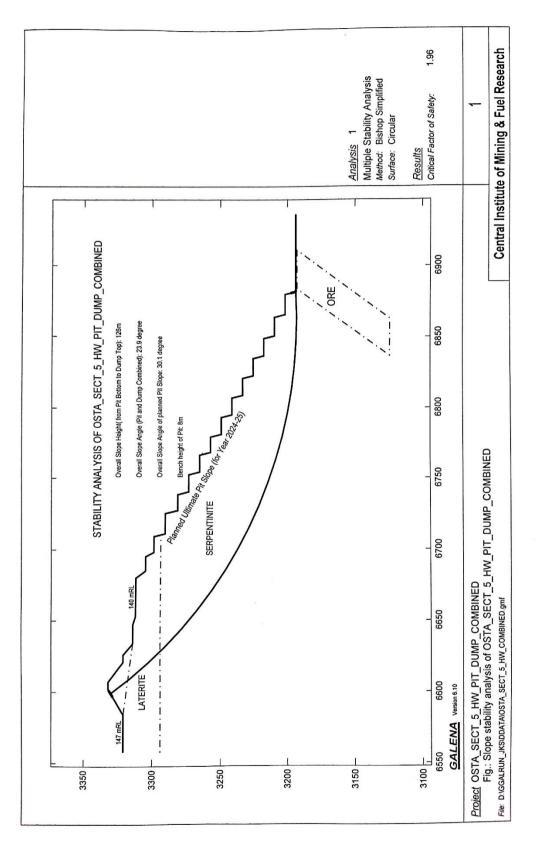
Stability analysis of Pit and Dump combined slope along Sect-5 Hangwall
